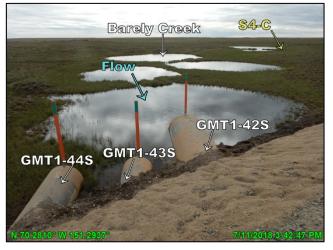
Barely Creek culvert battery inlet, looking southwest (upstream); July 11, 2018
